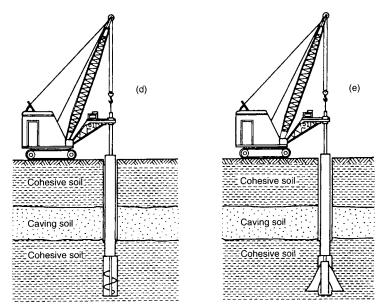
(d) dry augering into cohesive soil after sealing; (e) forming a bell. (After O'Neill and Reese. Reproduced from R. B. Peck, W. E. Hanson, and T. H. Thornburn, "Foundation Engineering," John Wiley & Sons, Inc., New York.) (Continued)
